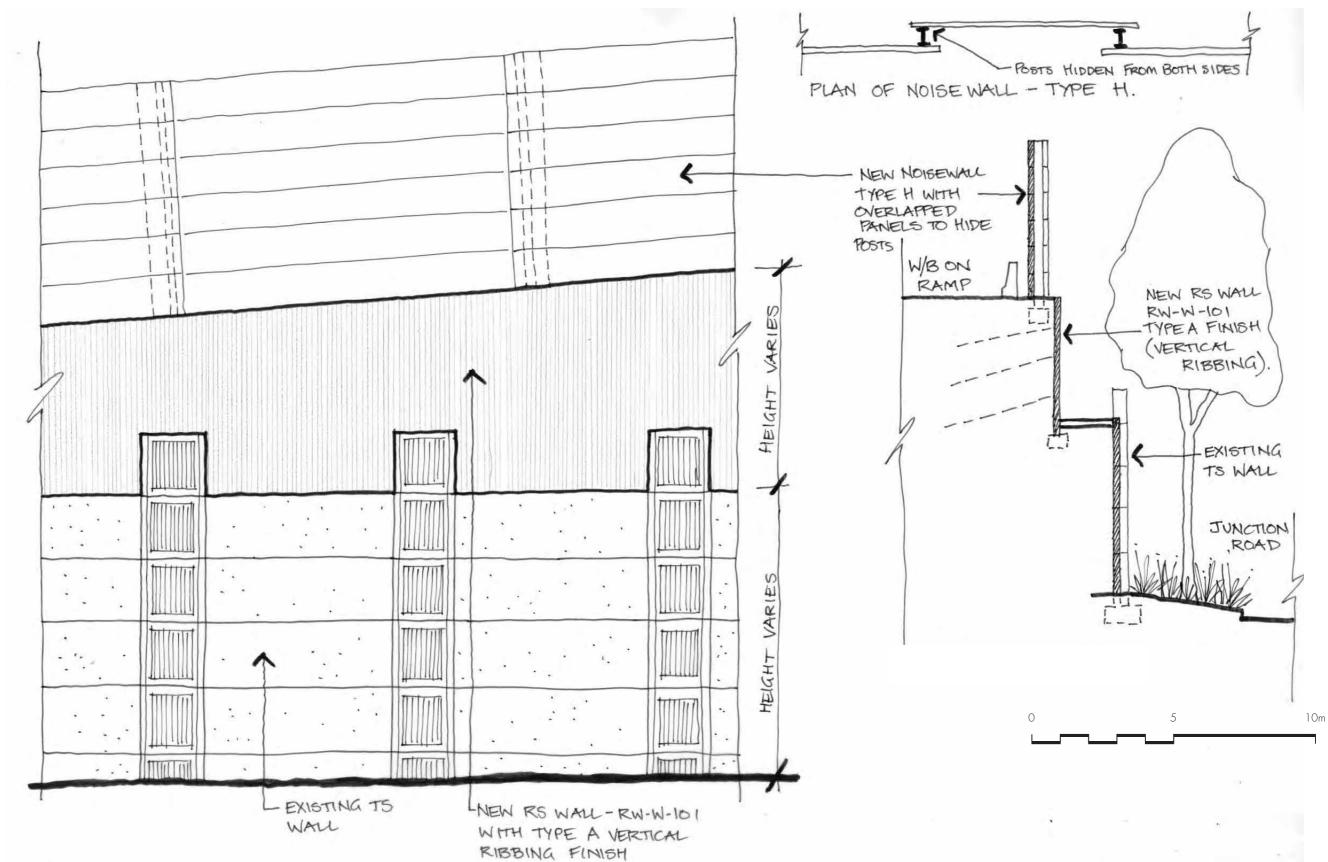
Type A Retaining Wall at Windsor Road Overbridge
